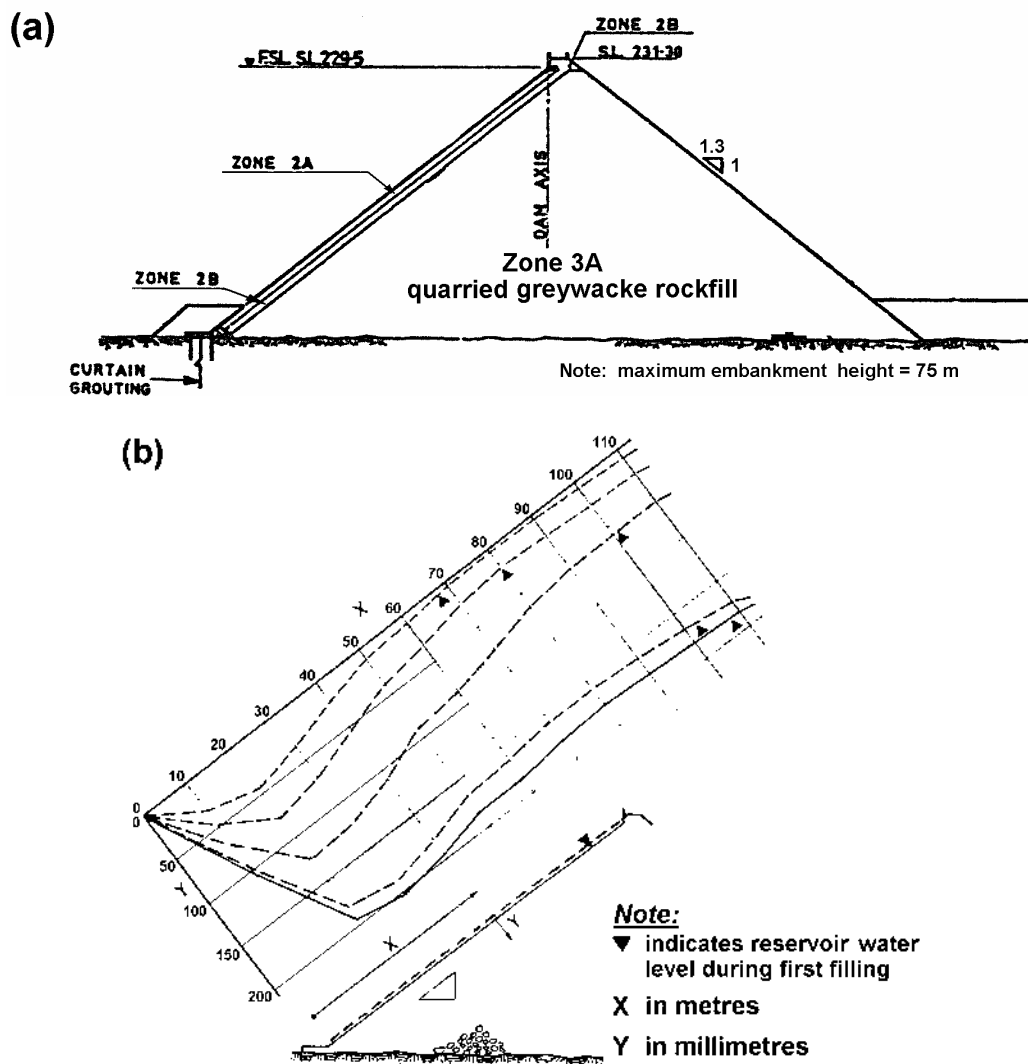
Mackintosh dam (a) embankment section (courtesy of Hydro Tasmania) and (b) face slab deformation on first filling (Knoop and Lack 1985)
